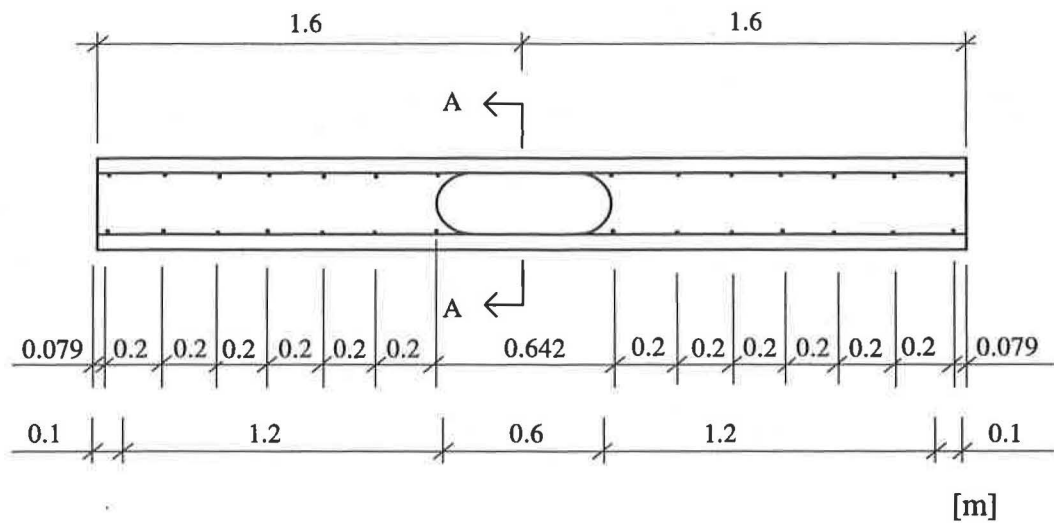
Reinforcement detailing of specimen RV13 (side elevation).
